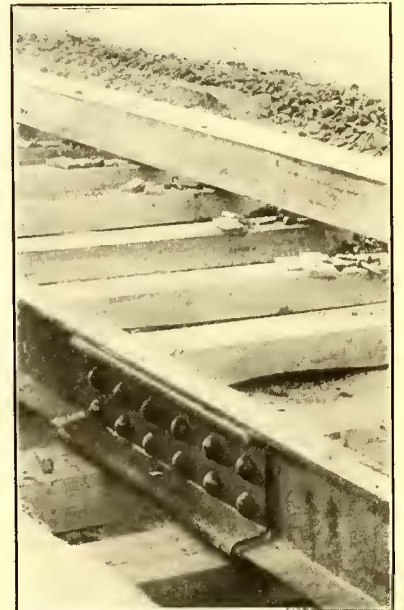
VIEW OF COMPLETED JOINT, HEAD SIDE
